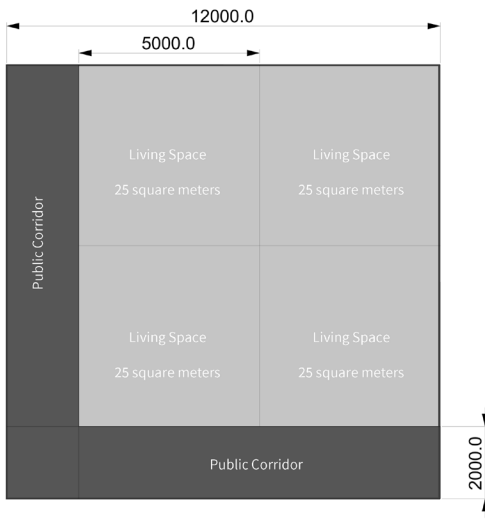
Plan of a single unit in modular design. *Source: Author.
